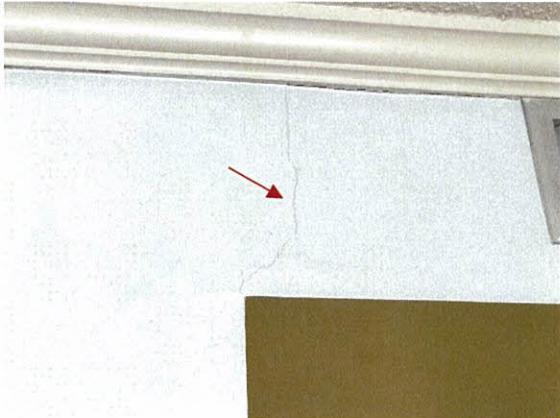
Crack at wall caused by the building movement from the wind pressures exerted on the building envelope during the Hurricane.
